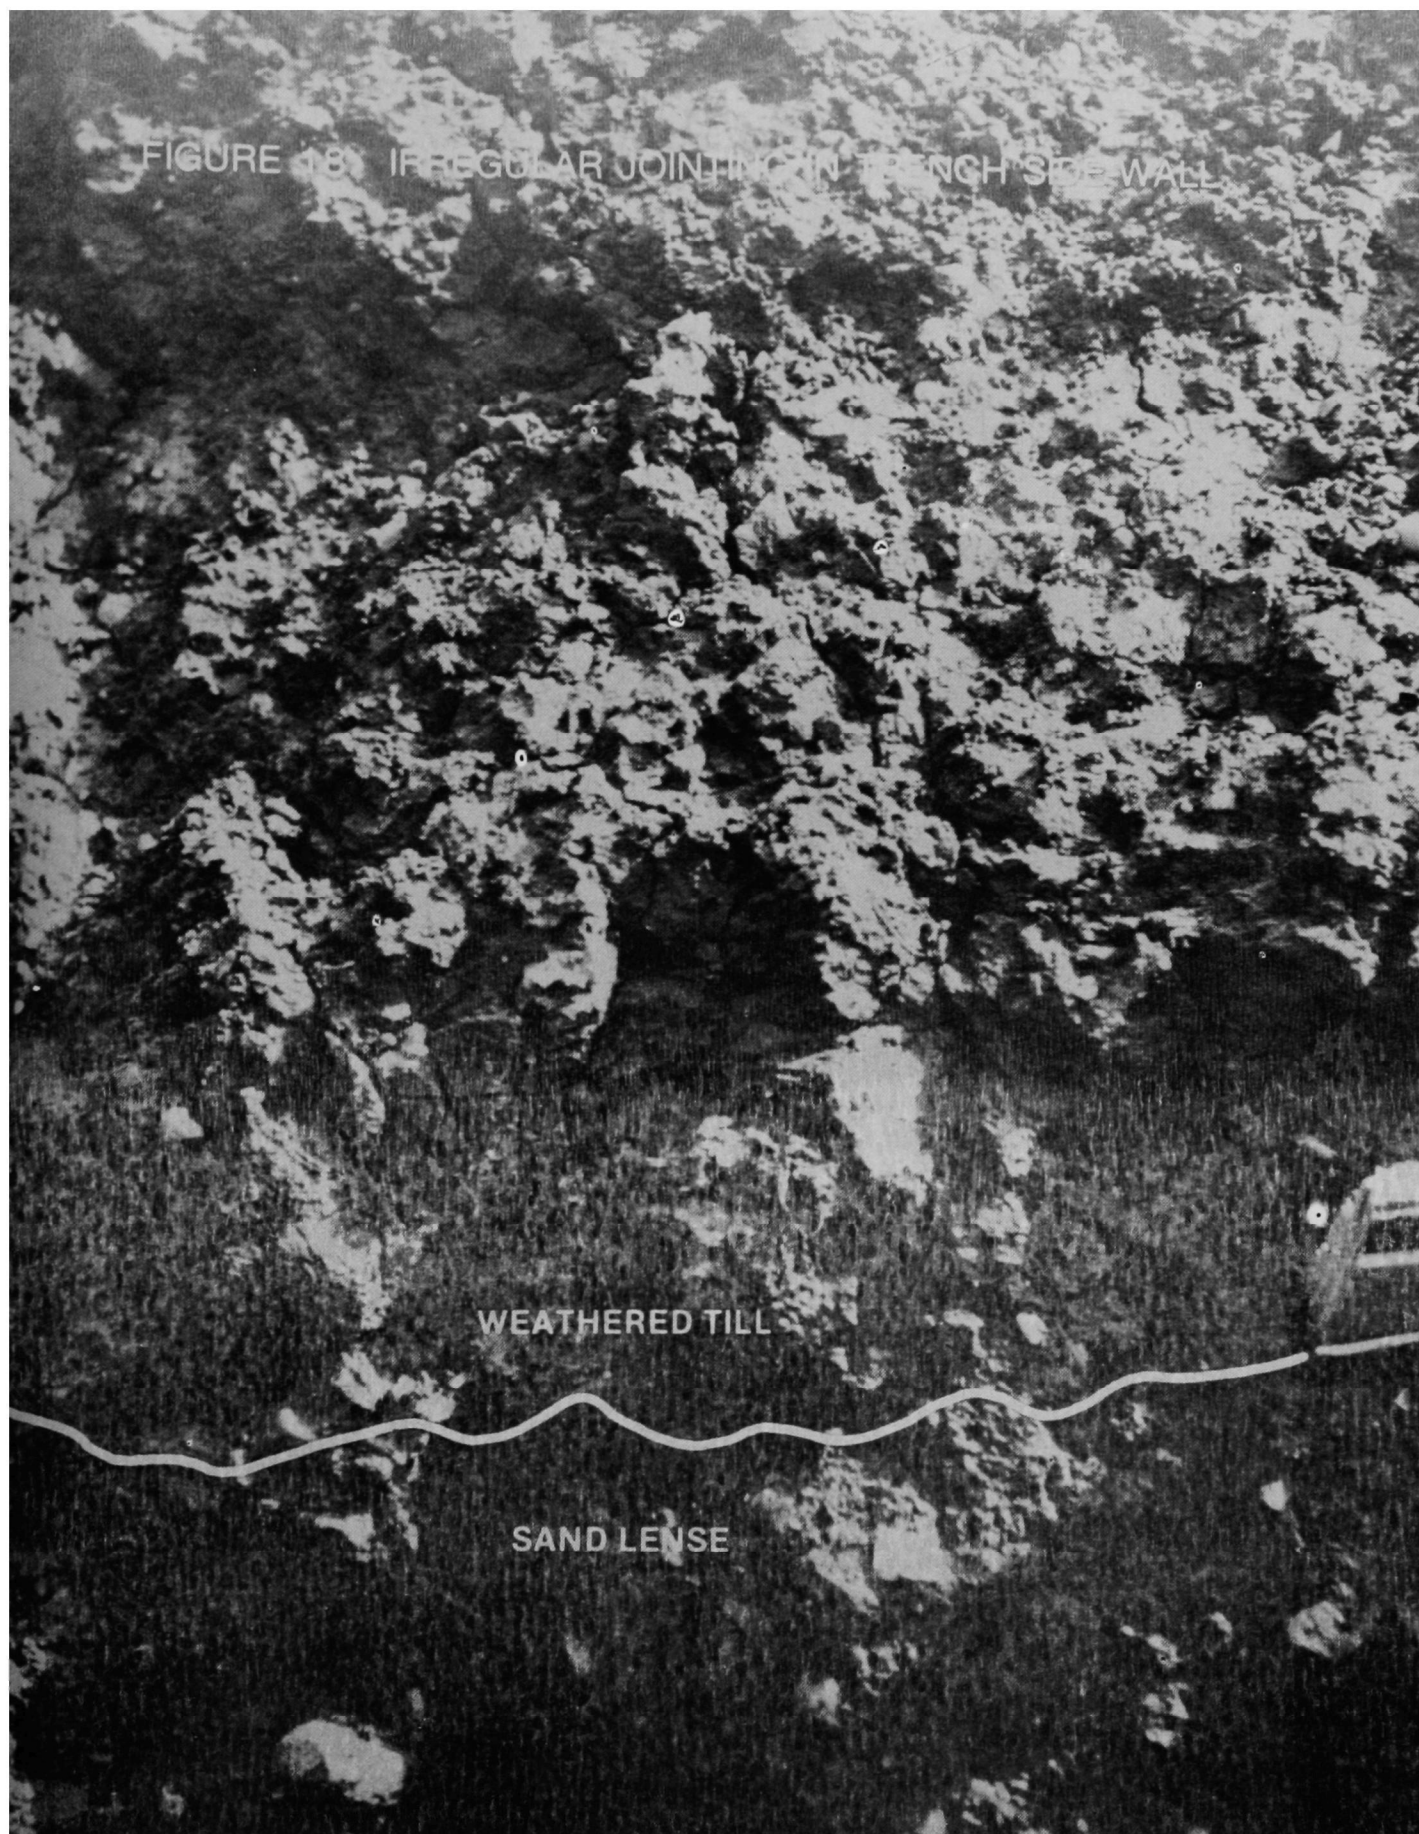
IRREGULAR JOINTING IN TRENCH SIDEWALL
